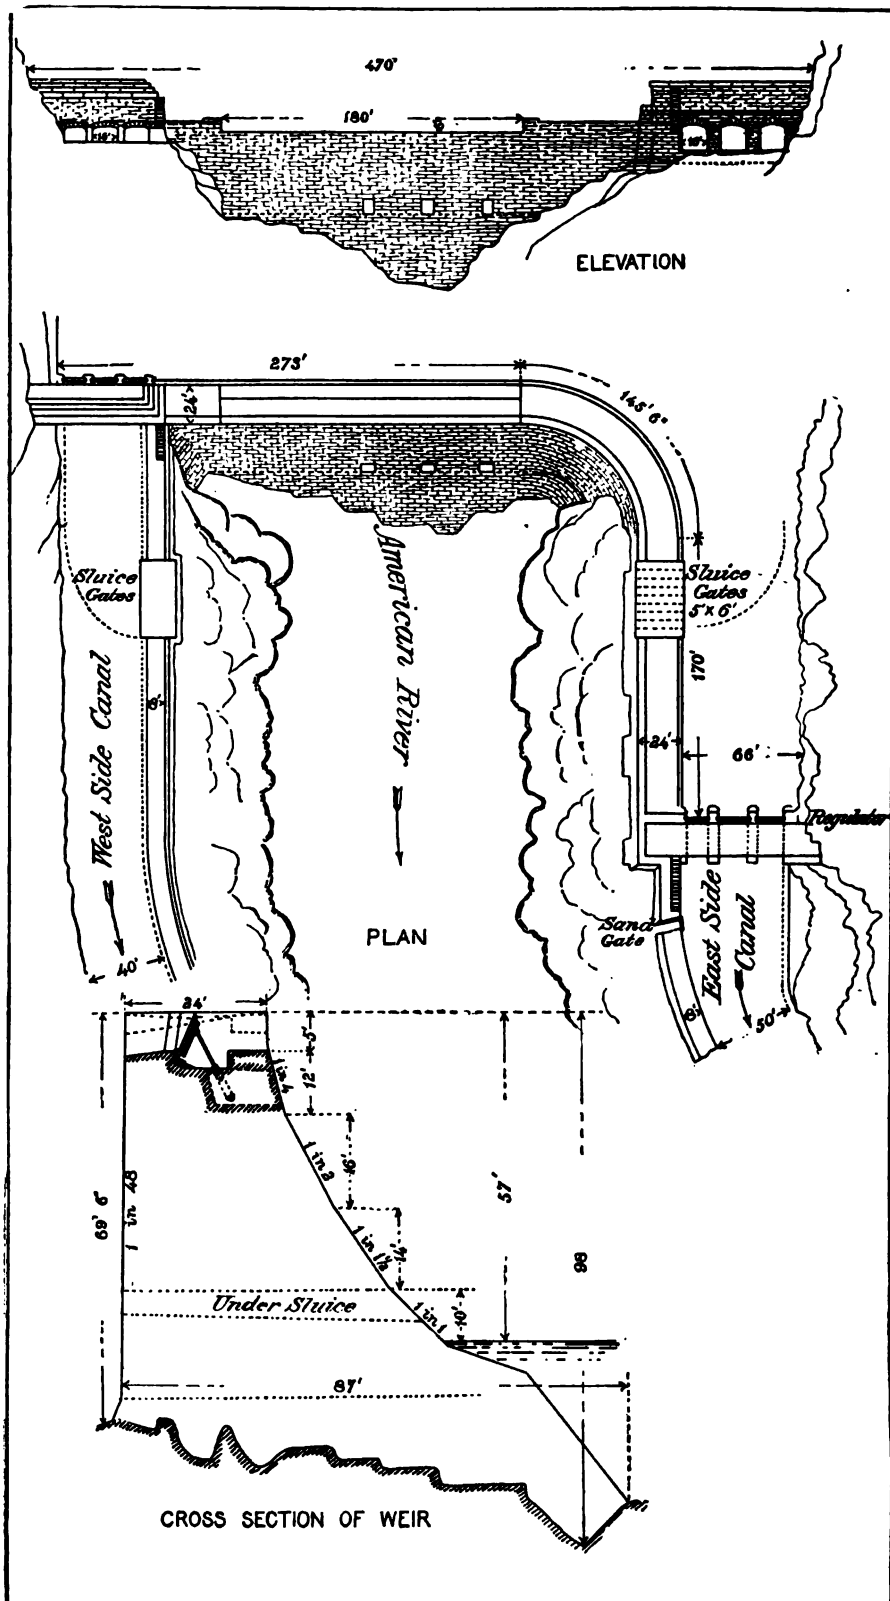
PLAN, CROSS-SECTION, AND ELEVATION OF WEIR AND HEADWORKS OF FOLSOM CANAL.
